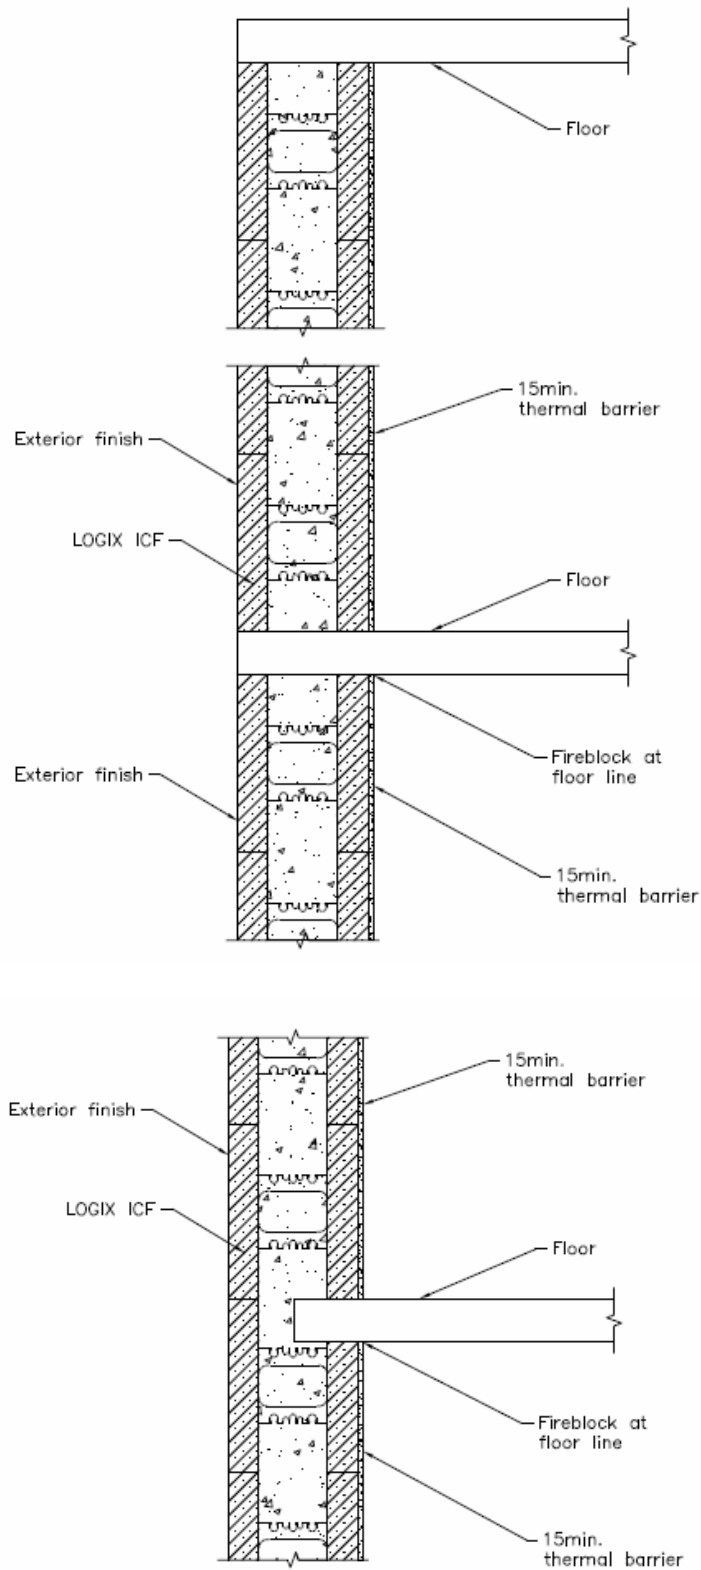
TYPICAL FLOOR-WALL DETAIL FOR NONCOMBUSTIBLE CONSTRUCTION
